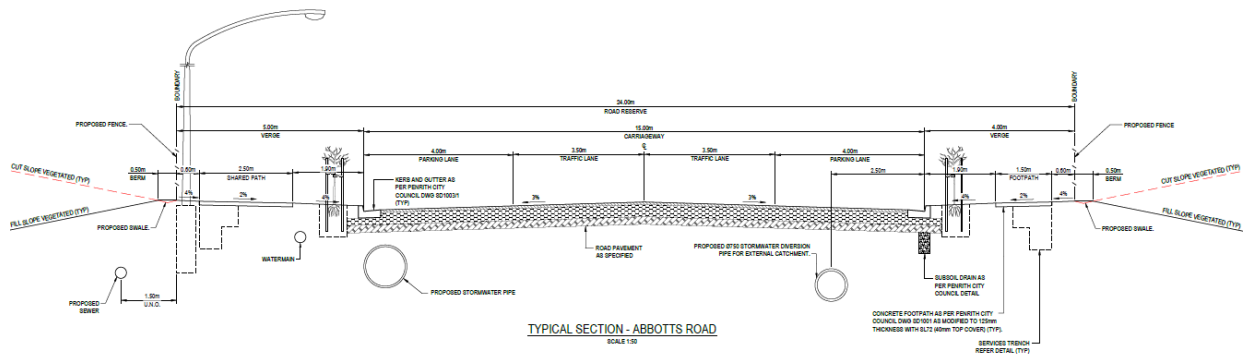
Typical Section of the proposed upgrade of Abbots Road
